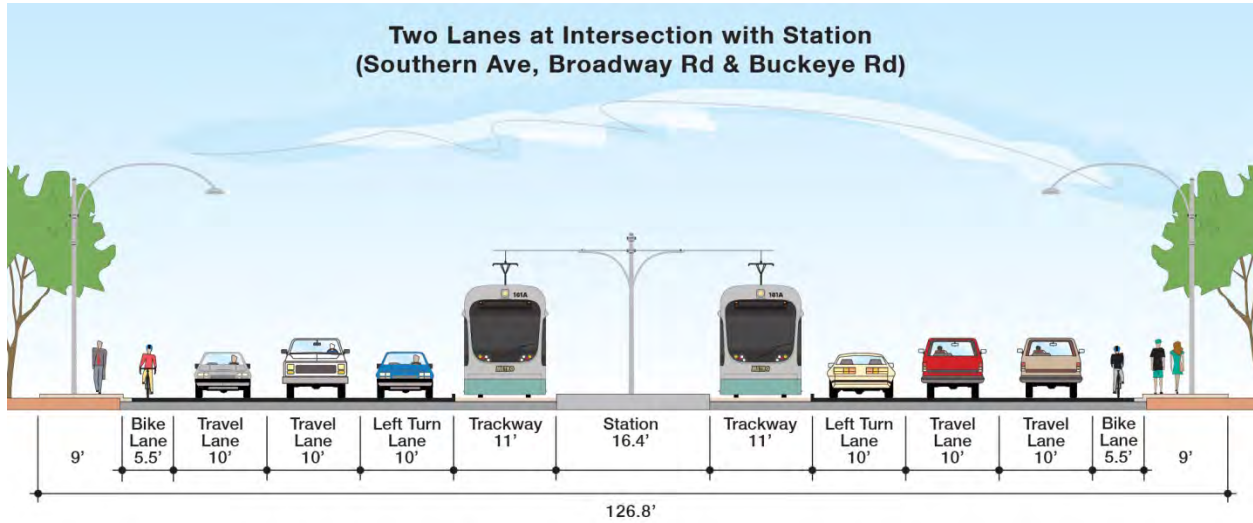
TYPICAL CROSS SECTION – SIGNAL LOCATION
